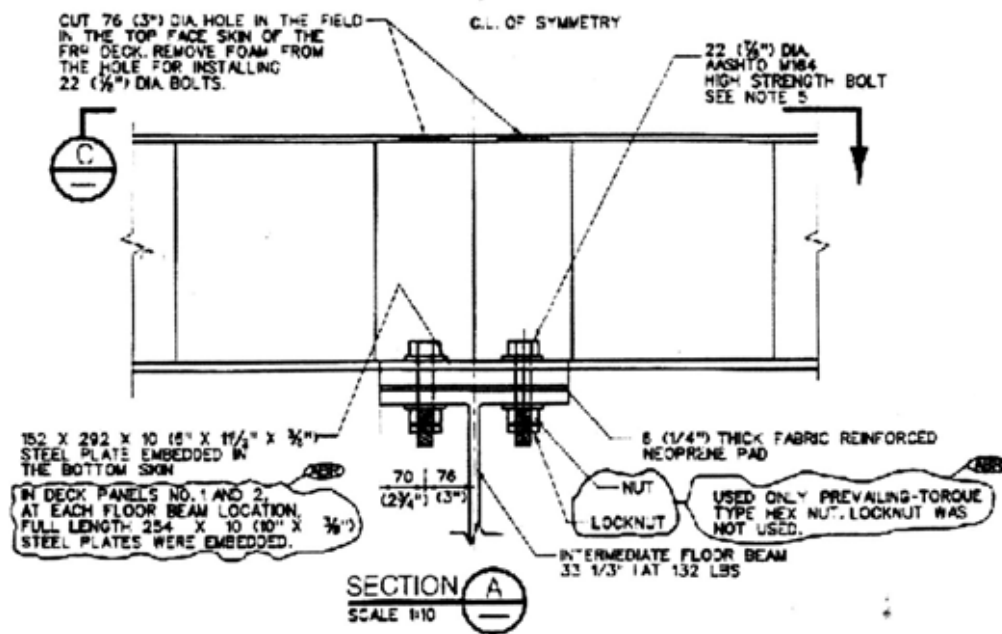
Lower face panel of Hardcore deck bolted directly to the steel girder, bridge over Bentley's Creek
